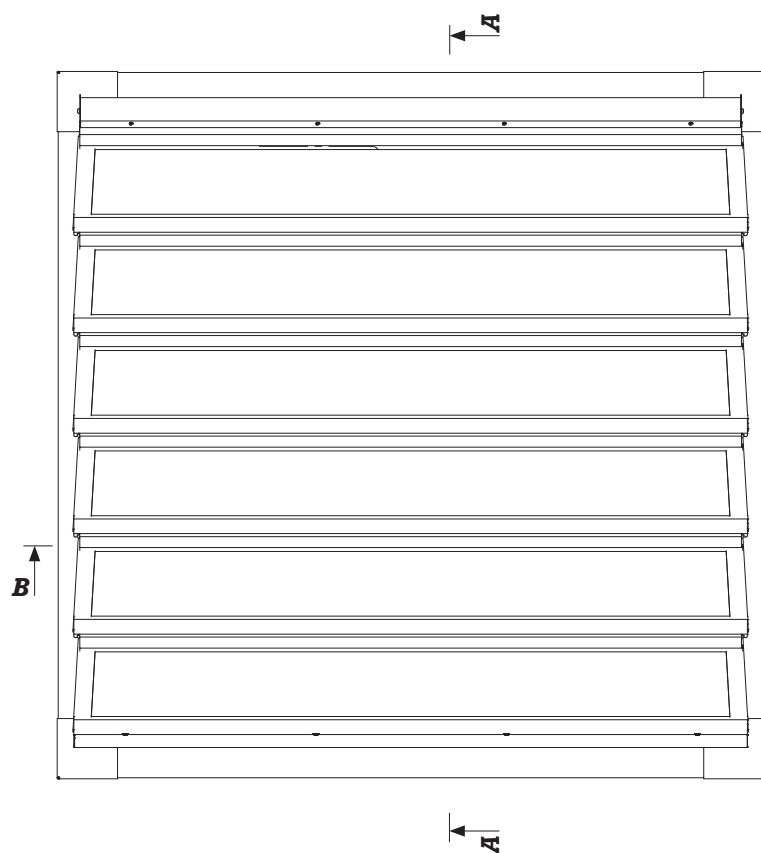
Top view of mcr LAM louvered vent in closed position (façade installation)
